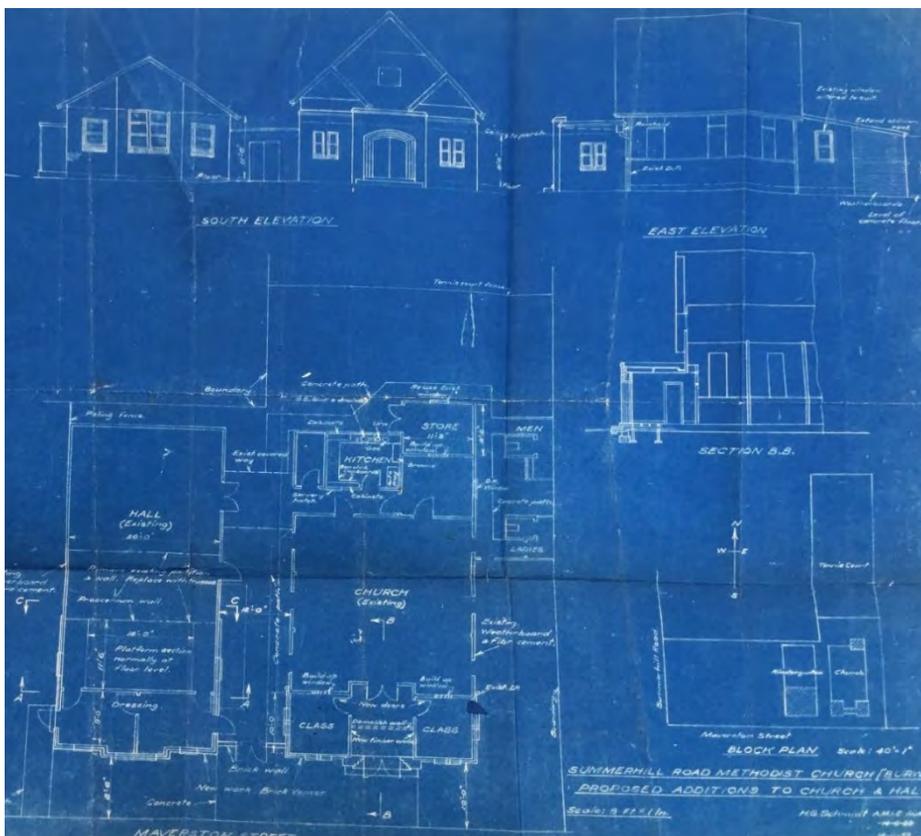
Plans and elevations for the 1952 additions to the church and Sunday school hall. (Source: Public Record Office Victoria)
